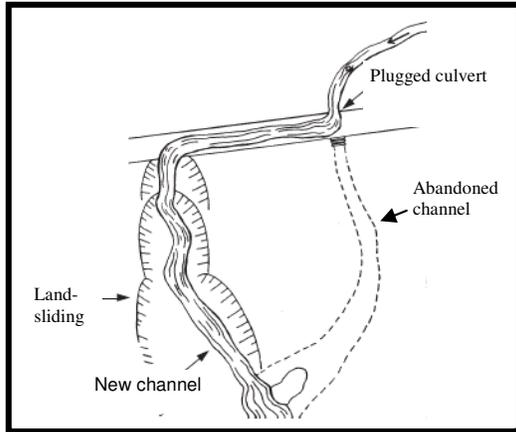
Schematic showing how a plugged culvert or other crossing failure can cause severe erosion by diverting water onto a road. When this water leaves the road it can cause gullying and/or landslides. Culvert failures due to overtopping or plugging with sediment and woody debris are common when the culvert diameter is less than the active channel width, the culvert is not set to the stream grade, or the culvert is poorly aligned with the stream channel (taken from Keller and Sherar, 2003).
